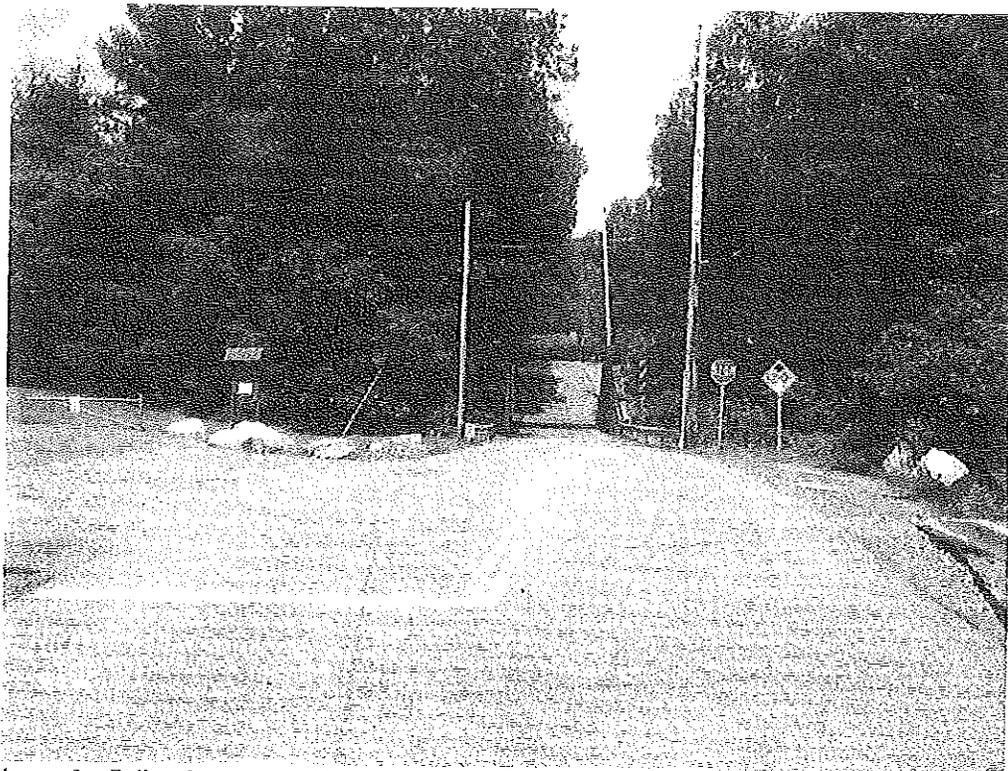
Railroad overpass 200 feet east of Bridge #02866. The width of this overpass limits the roadway to a single lane, which may be the reason Bridge #02866 was not widened in 1973.
